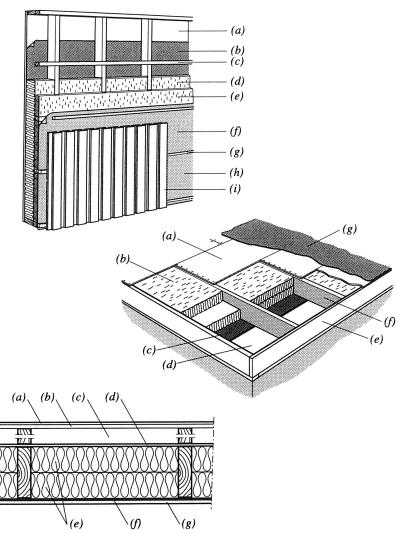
Timber frame wall, floor and roof - components (NBI Building Details A 523.255, A 522.355 and A 525.100).
